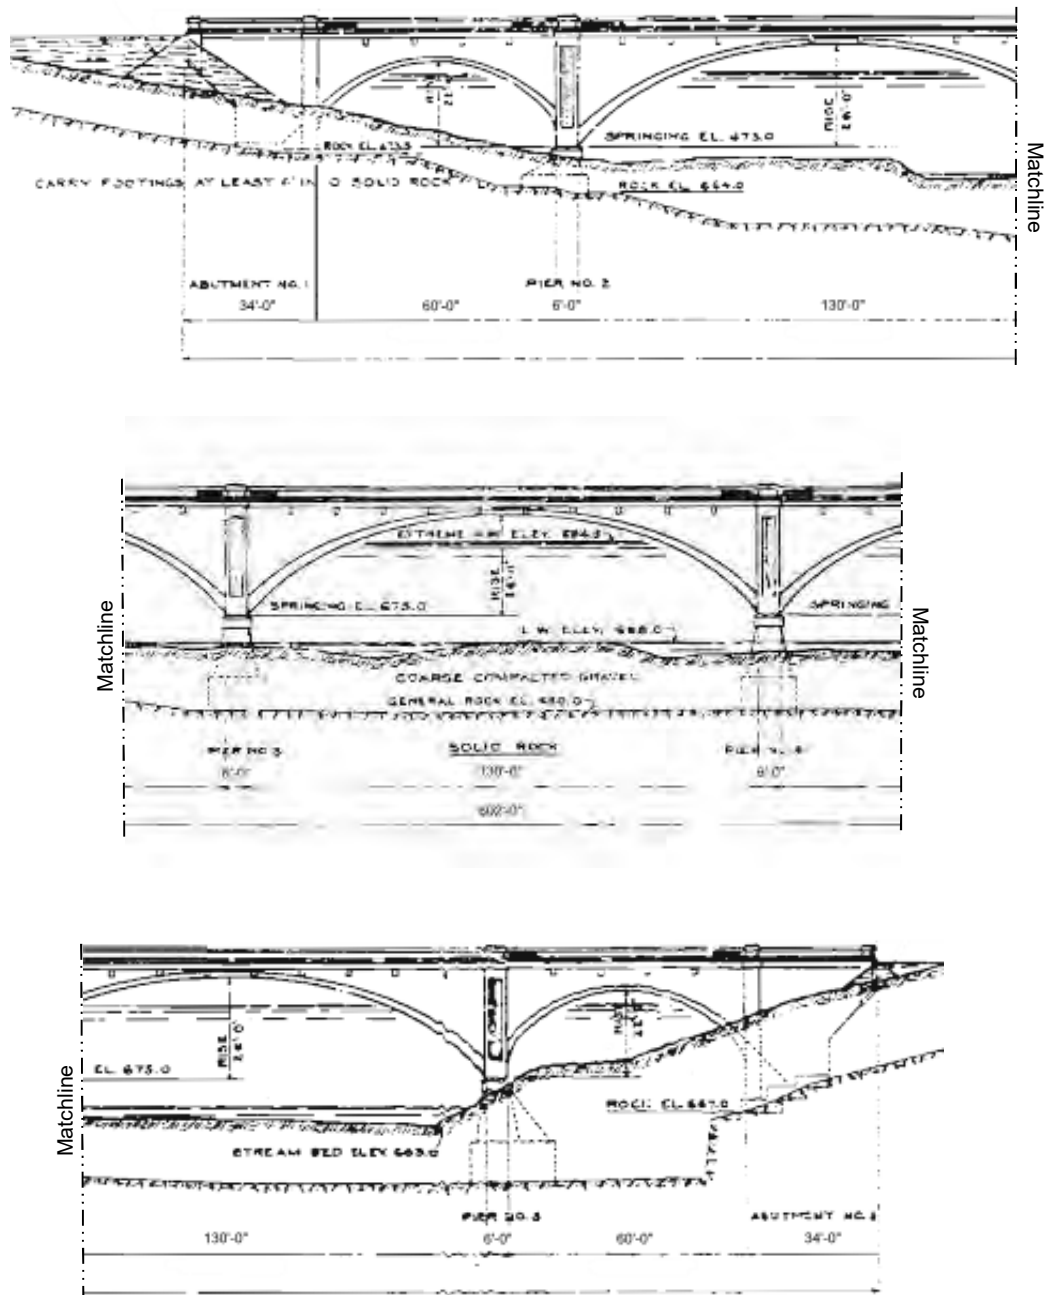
Current River Bridge (G0804) Typical Section through Arch Spans
